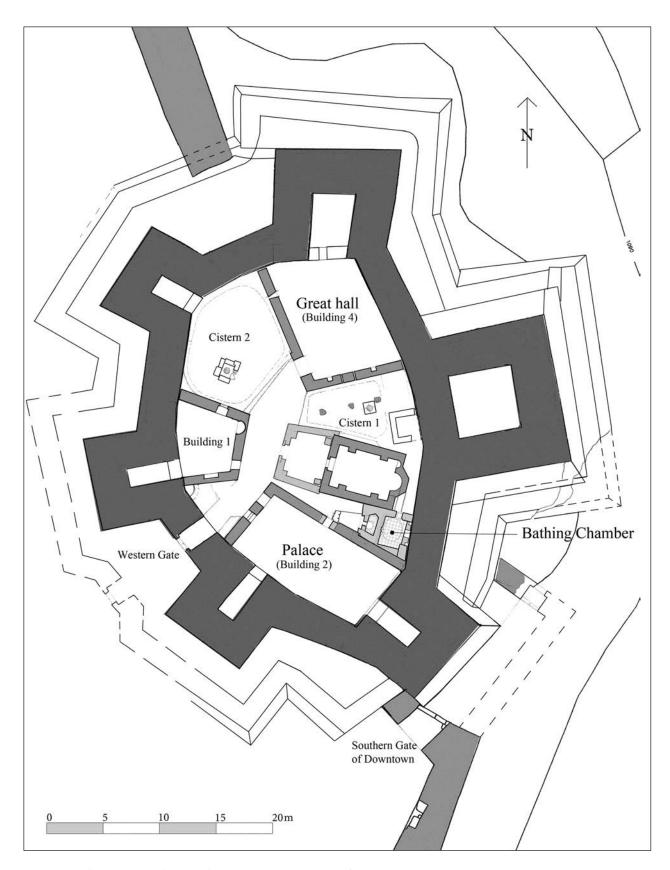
Castle of Novo Brdo, site plan (after M. Popović 2016)
